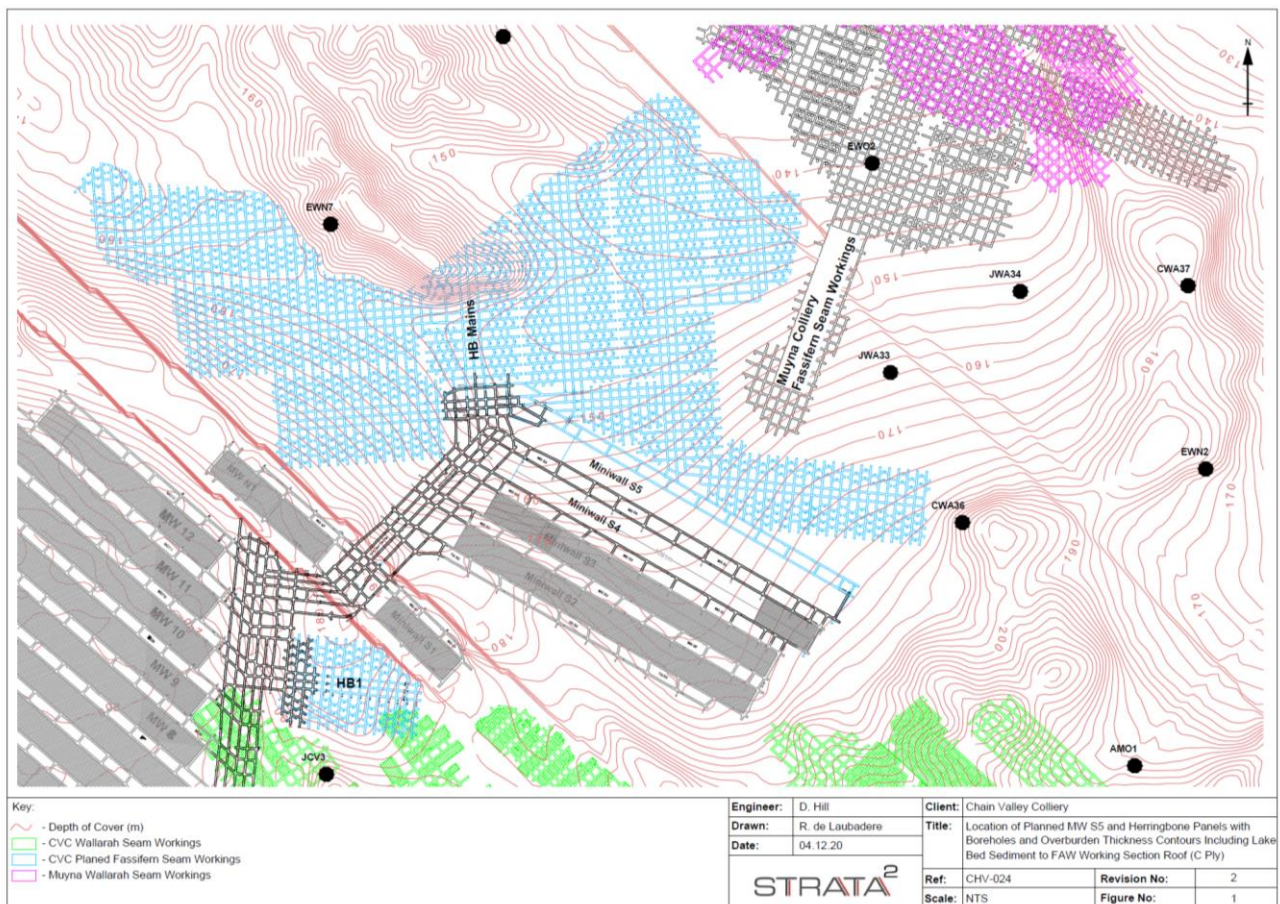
Overlying Wallarah workings and Myuna workings (Wallarrah and Fassifern seams)
